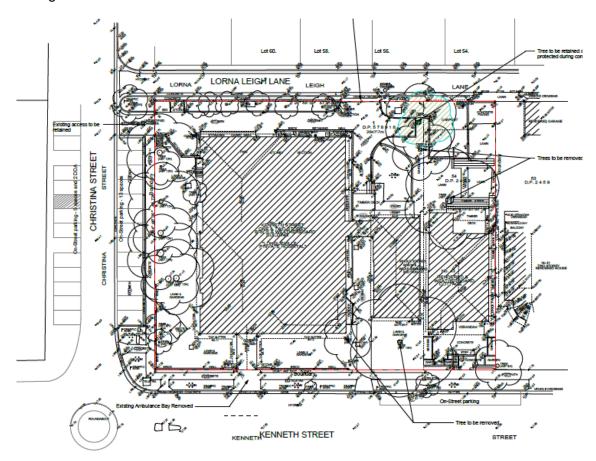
Existing Predominant Single Storey Scale of the Hospital Facility
